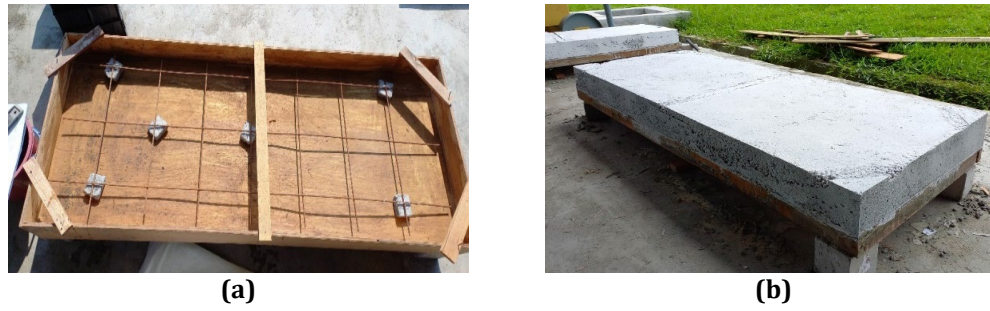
Sample of slab (a) Reinforcement steel mesh; (b) Reinforced concrete slab
